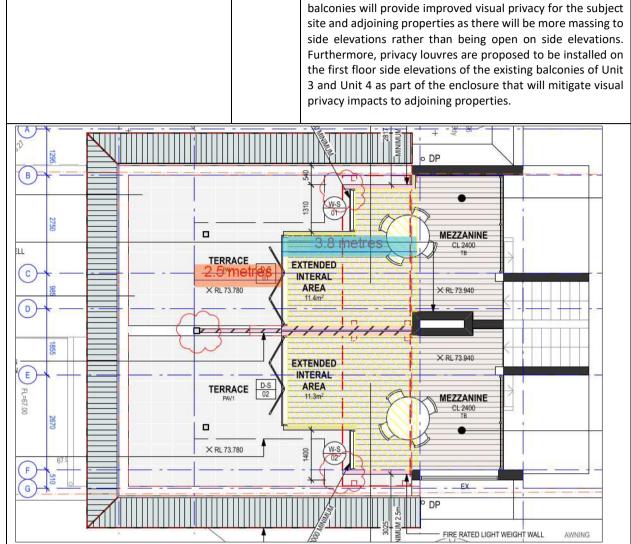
A: Measurement of extension of mezzanine (blue) and extension of roof over terrace calculated from the mezzanine extension (orange)
